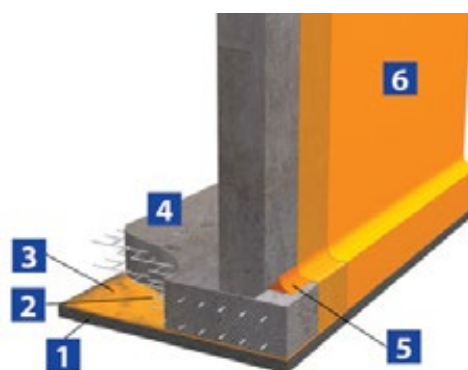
Recommended waterproofing method for the foundation slab: 1 - lean concrete; 2 - reinforcement; 3 - Hydrostop-Mix sifted under slab (3kg/m²); 4 - edge of slab sealed with Hydrostop-Professional Compound; 5 - wedge-shaped seal from Hydrostop-Mortar; 6 - vertical waterproofing from Hydrostop-Professional Compound.
